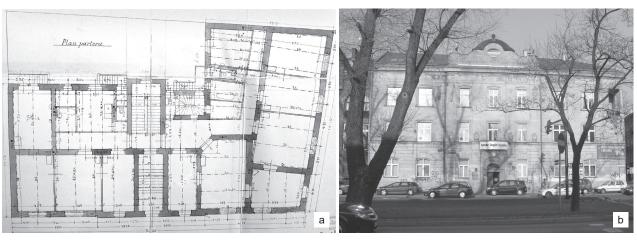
Townhouse at 17 Krasińskiego Avenue / 37 Smoleńsk Street (designed by J. Pokutyński, 1907–1908): a) ground floor plan (source: ANK, ABM Krasińskiego 17, fsc. 446), b) façade (photo by B. Makowska)
